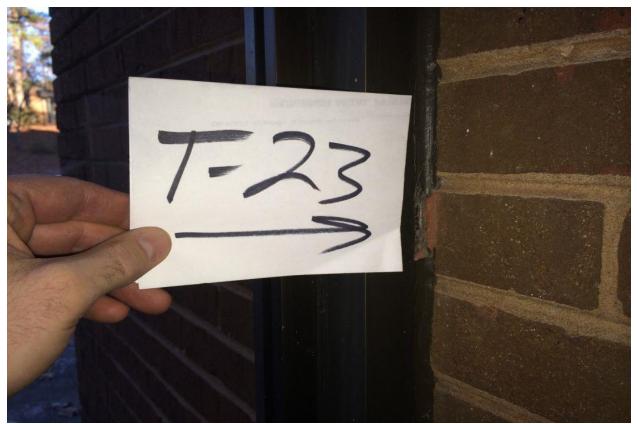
Laboratory analyses did not detect asbestos minerals within the window caulk sample TS-23 collected from the Theatre Building windows.
